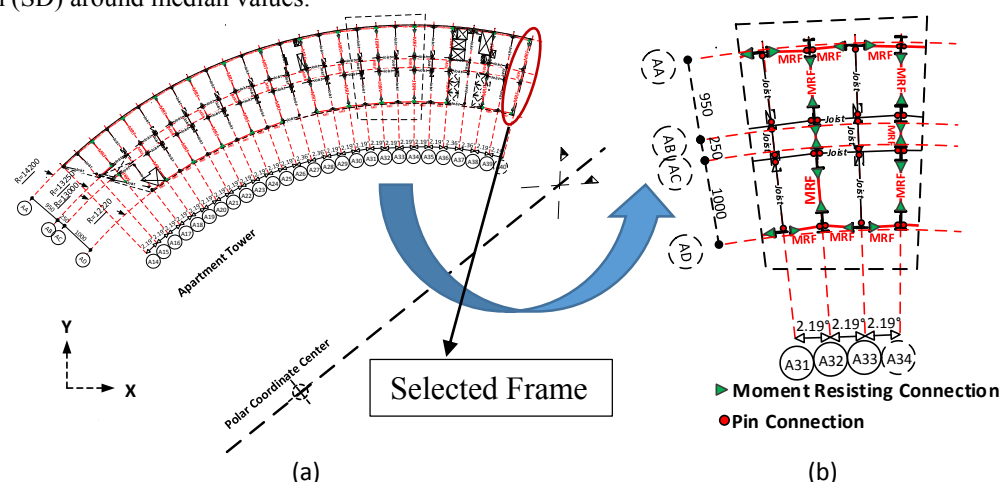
(a) Typical structural floor plan (b) moment resisting connection arrangements
